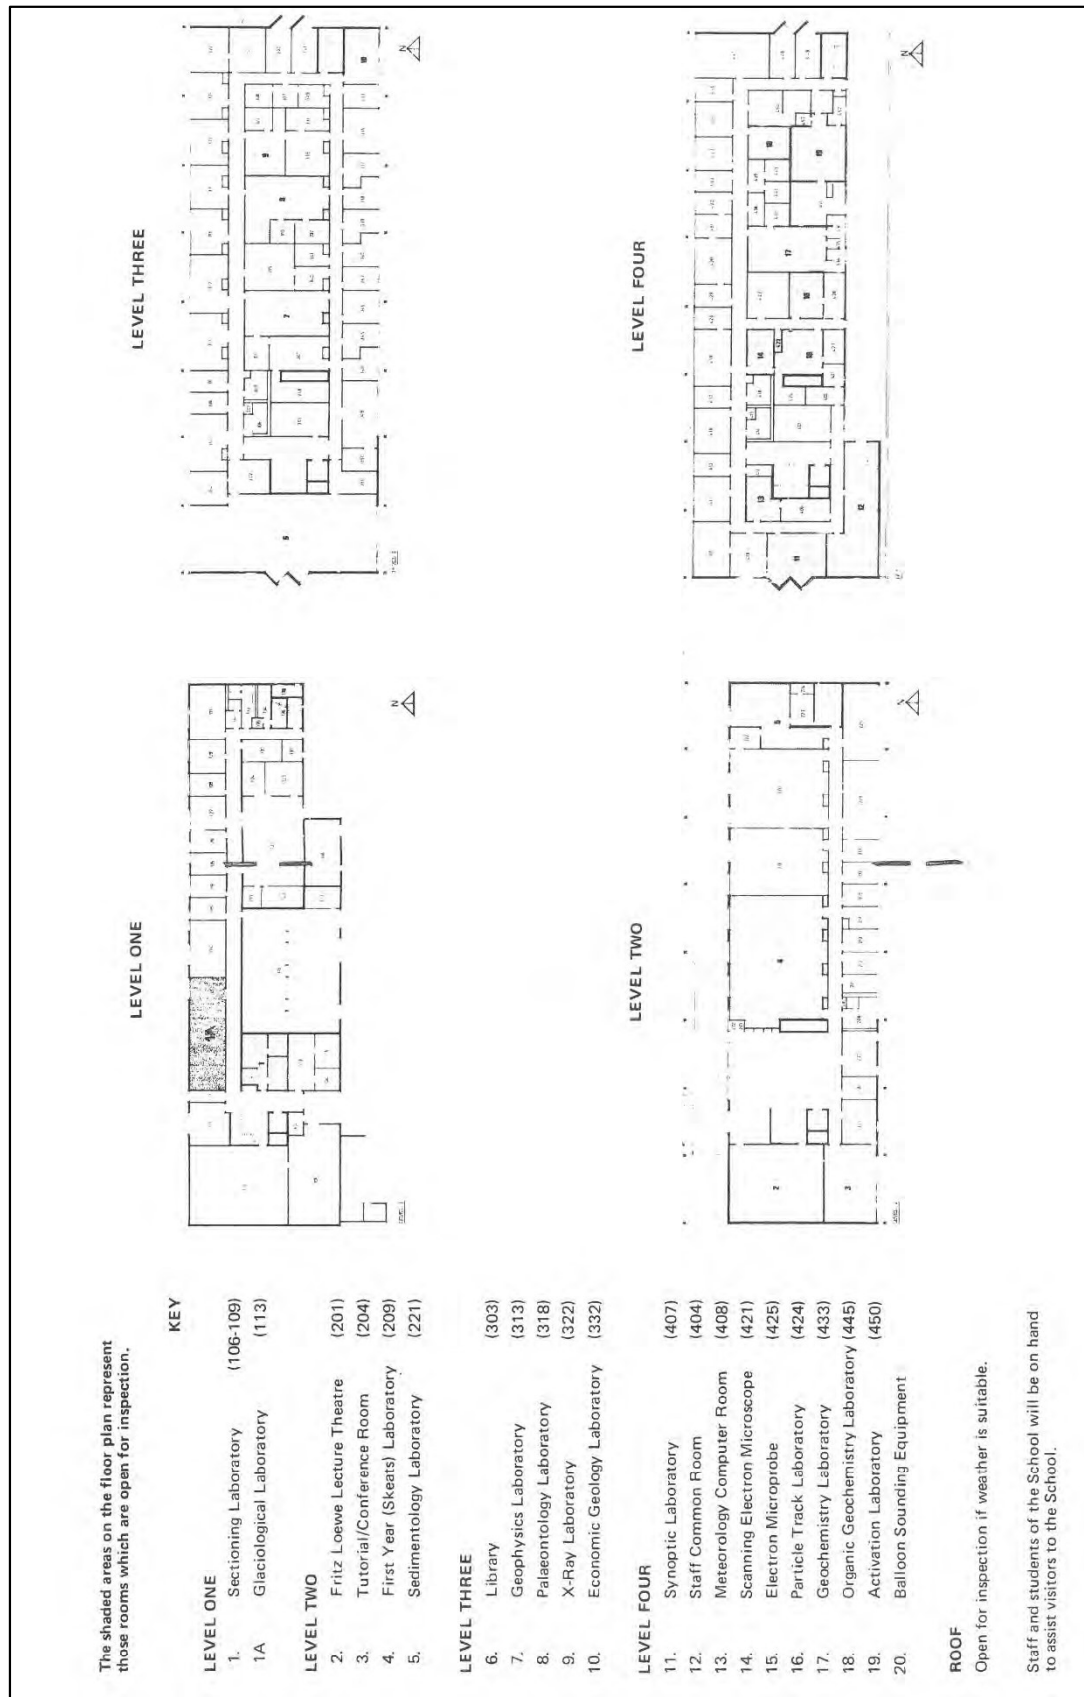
Floor plan of the subject building's interior plans and layout, 1977
